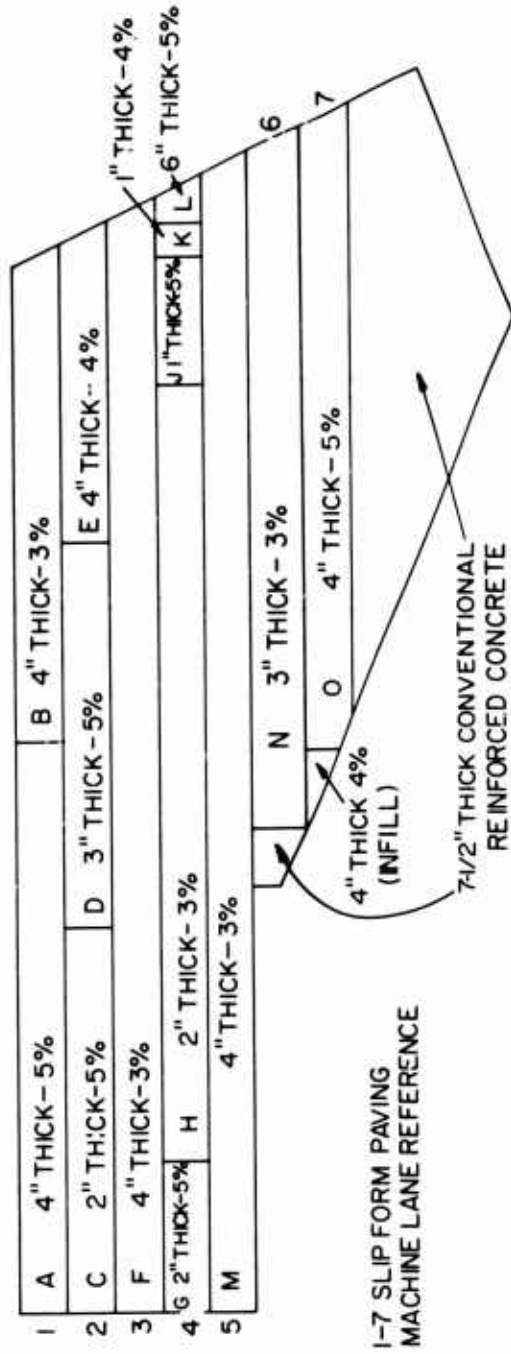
Pavement Layout of Slab Thickness and Wire Content
